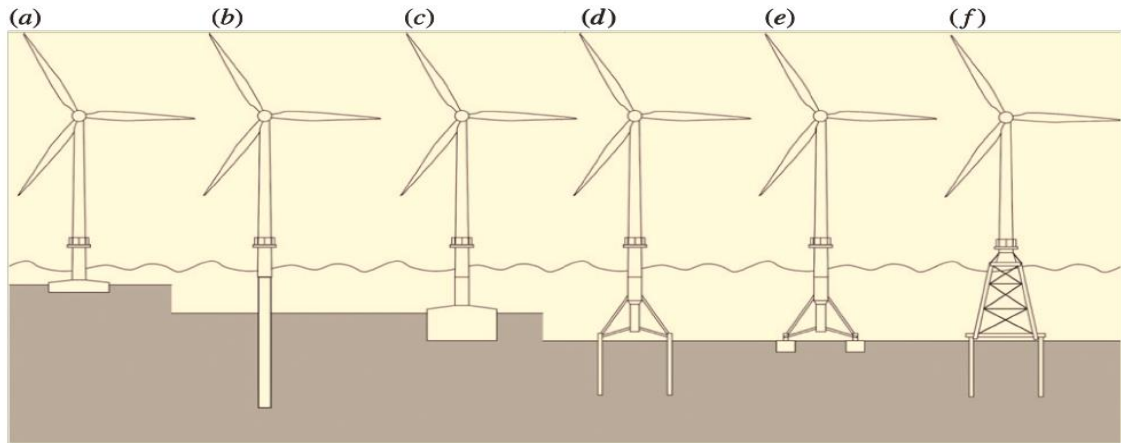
Support Structures in existence. (Gentils et al., 2017); (a) gravity-based foundation (b) monopole foundation (c) caisson foundation, (d) multiple foundation, (e) multi-caisson foundation (f) jacket foundation.
